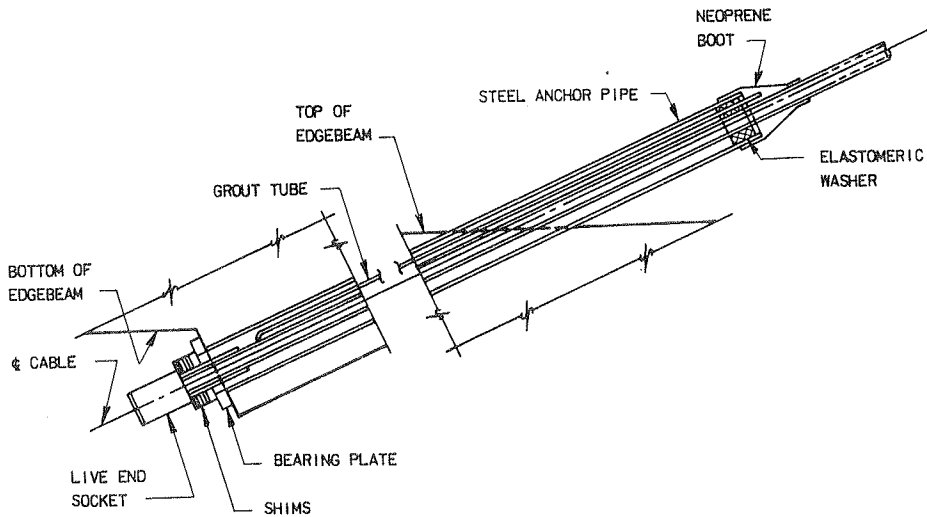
Concrete alternative: edge beam cable attachment details.
